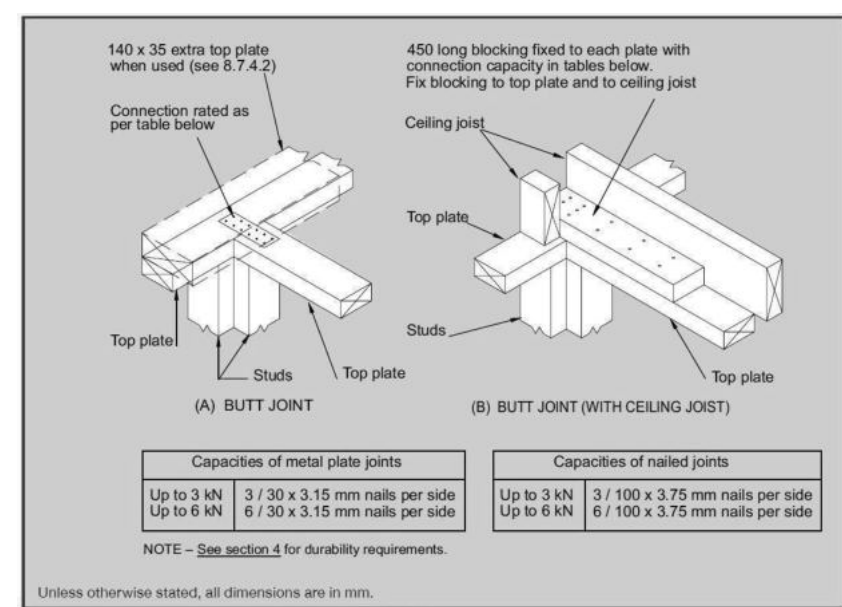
Connecting top plates to external walls at right angles - Walls containing bracing (see 8.7.3.4)
